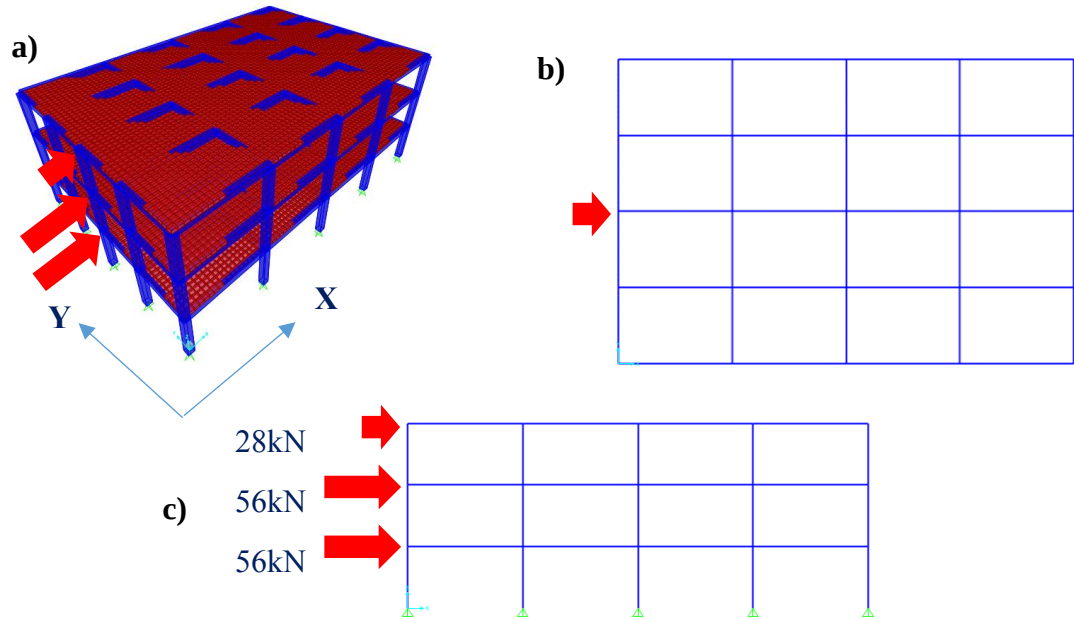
Wind load application in the X-direction a) 3D view, b) plan view, c) elevation view
